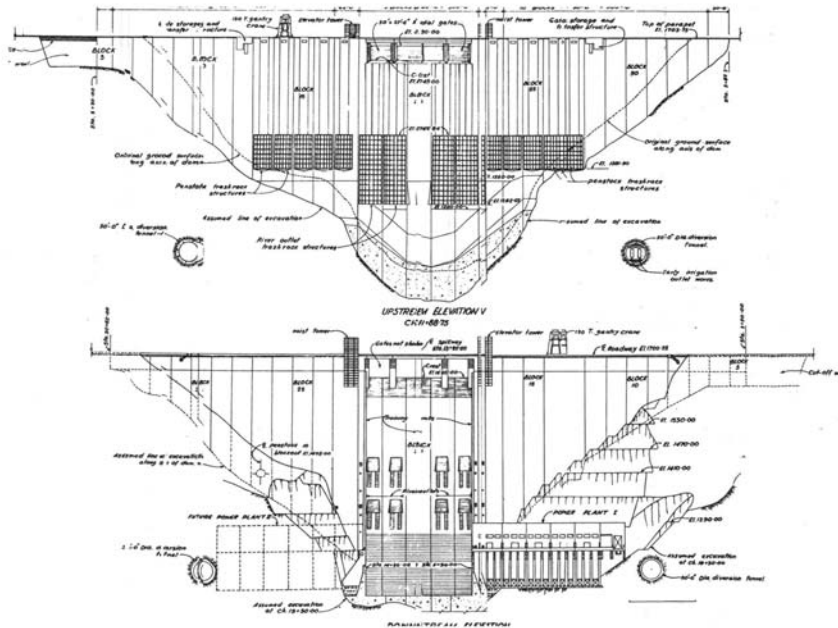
UPSTREAM AND DOWNSTREAM ELEVATION OF BHAKRA DAM SHEARING POSITION OF RIVERS OUTLETS
